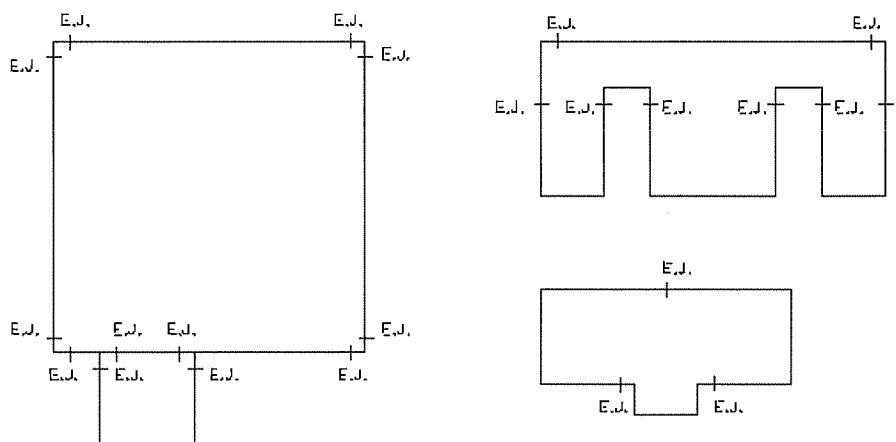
Typical Expansion Joint Placement (will vary with size of building)
